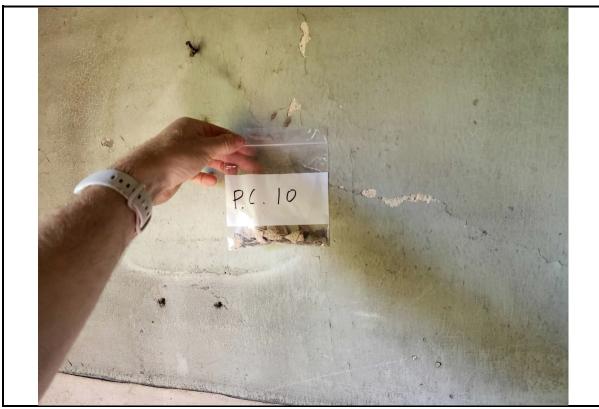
PC 10: Confirmed lead-containing teal paint on the plaster kitchen wall.
